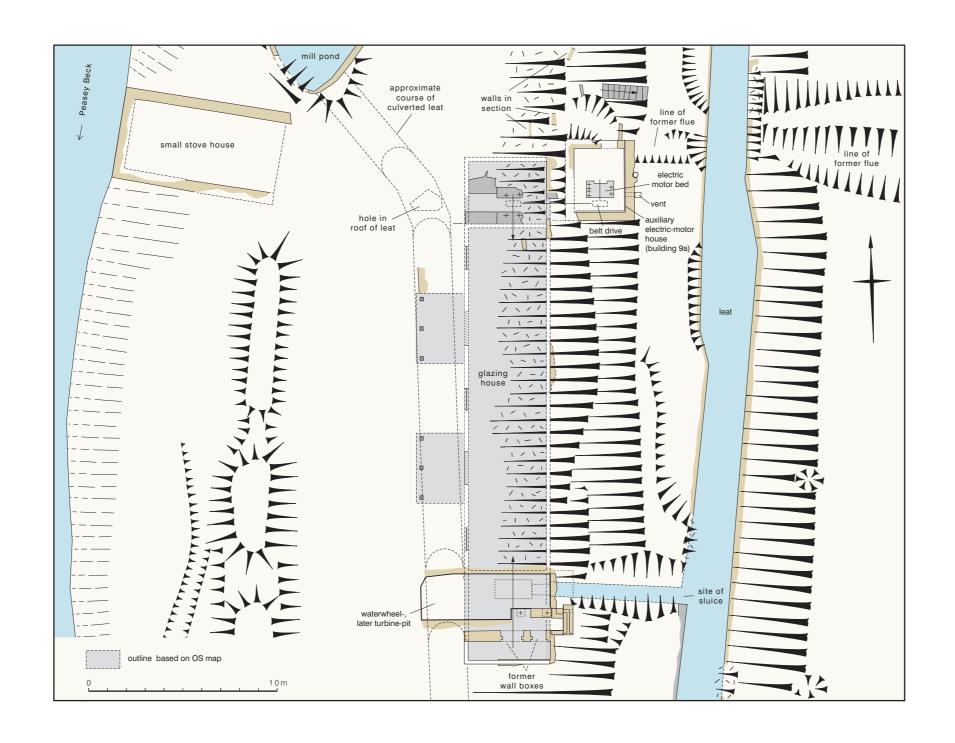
Plan of the glazing house and small stove house (© English Heritage)
